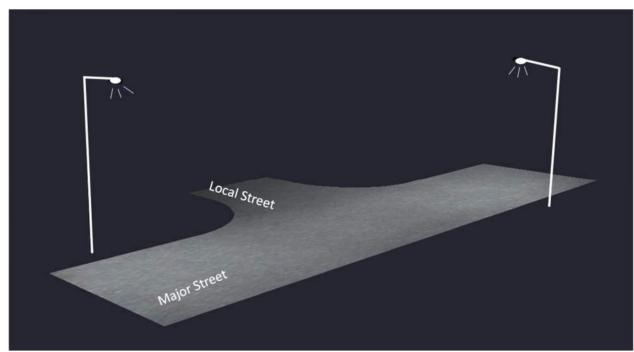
Rendering of T-Intersection: Local Street vs Major Street – Isometric View
